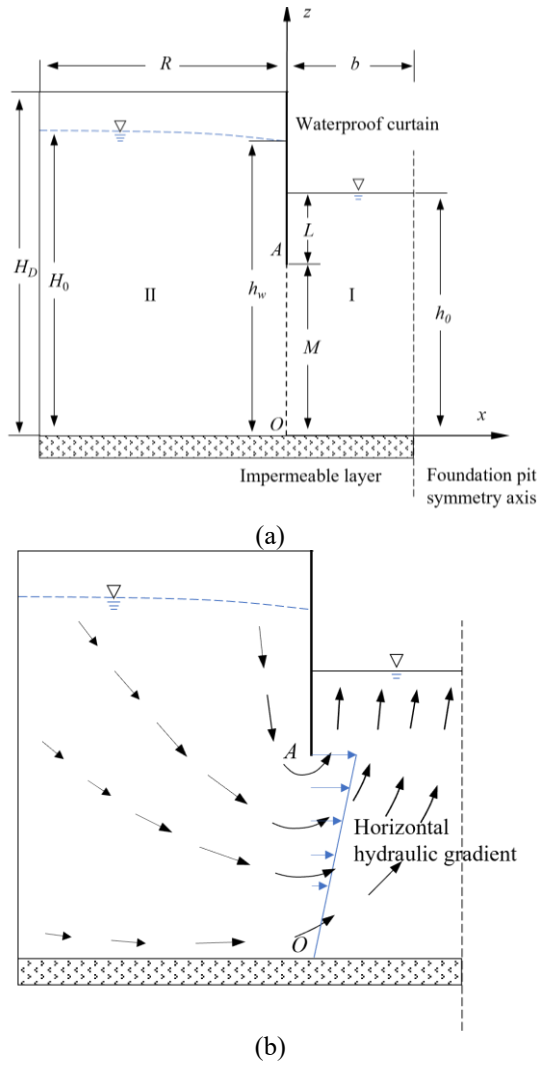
Foundation pit seepage model: (a) Seepage field calculation model, (b) Seepage field of foundation pit with suspended waterproof curtain
